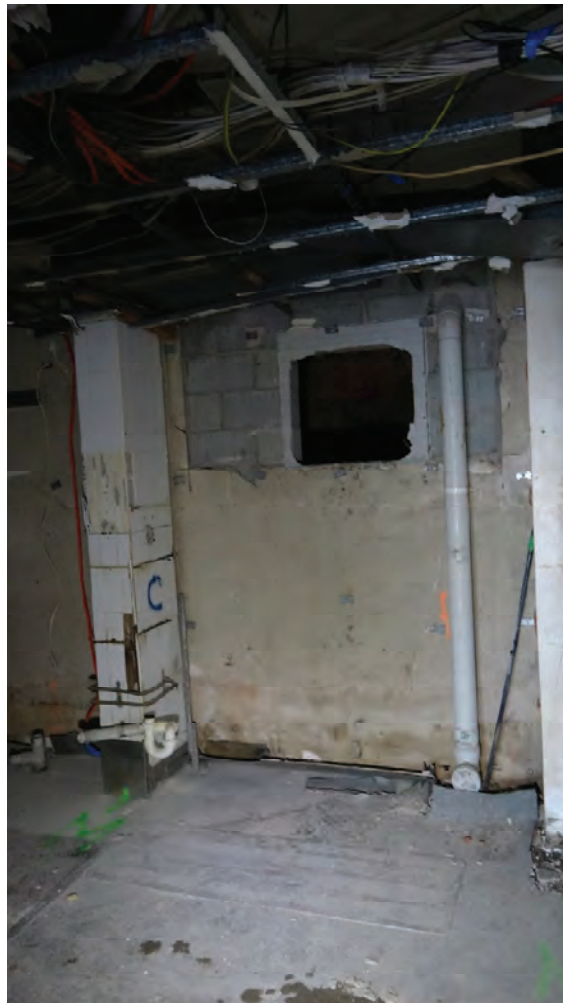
Rear retaining wall between grids M and N. Note the hole in the block infill to the undercroft.
